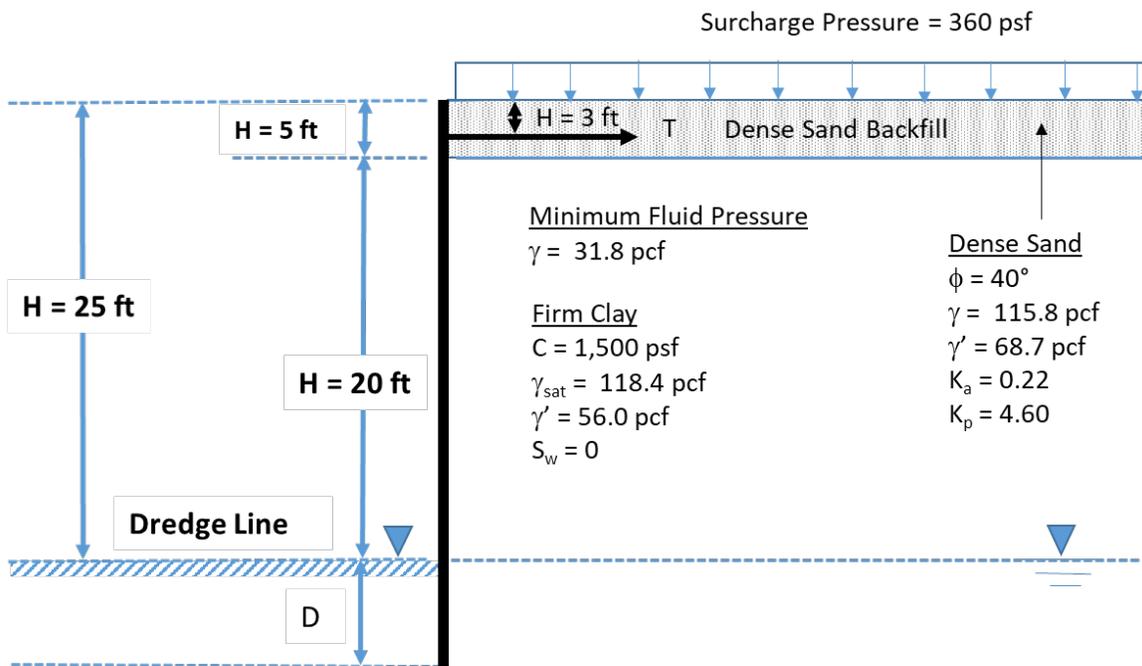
Case 5 Anchored cantilever TERS in firm clay.
